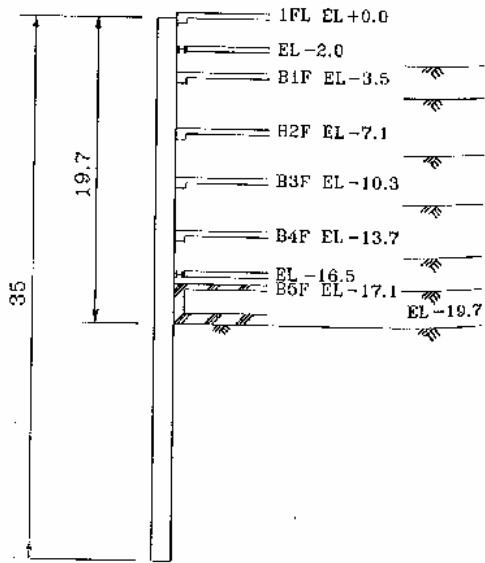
Construction sequence for the TNEC excavation project. All values are in meters. EL, elevation. (by Ou, Shiau, Wang (2000))
